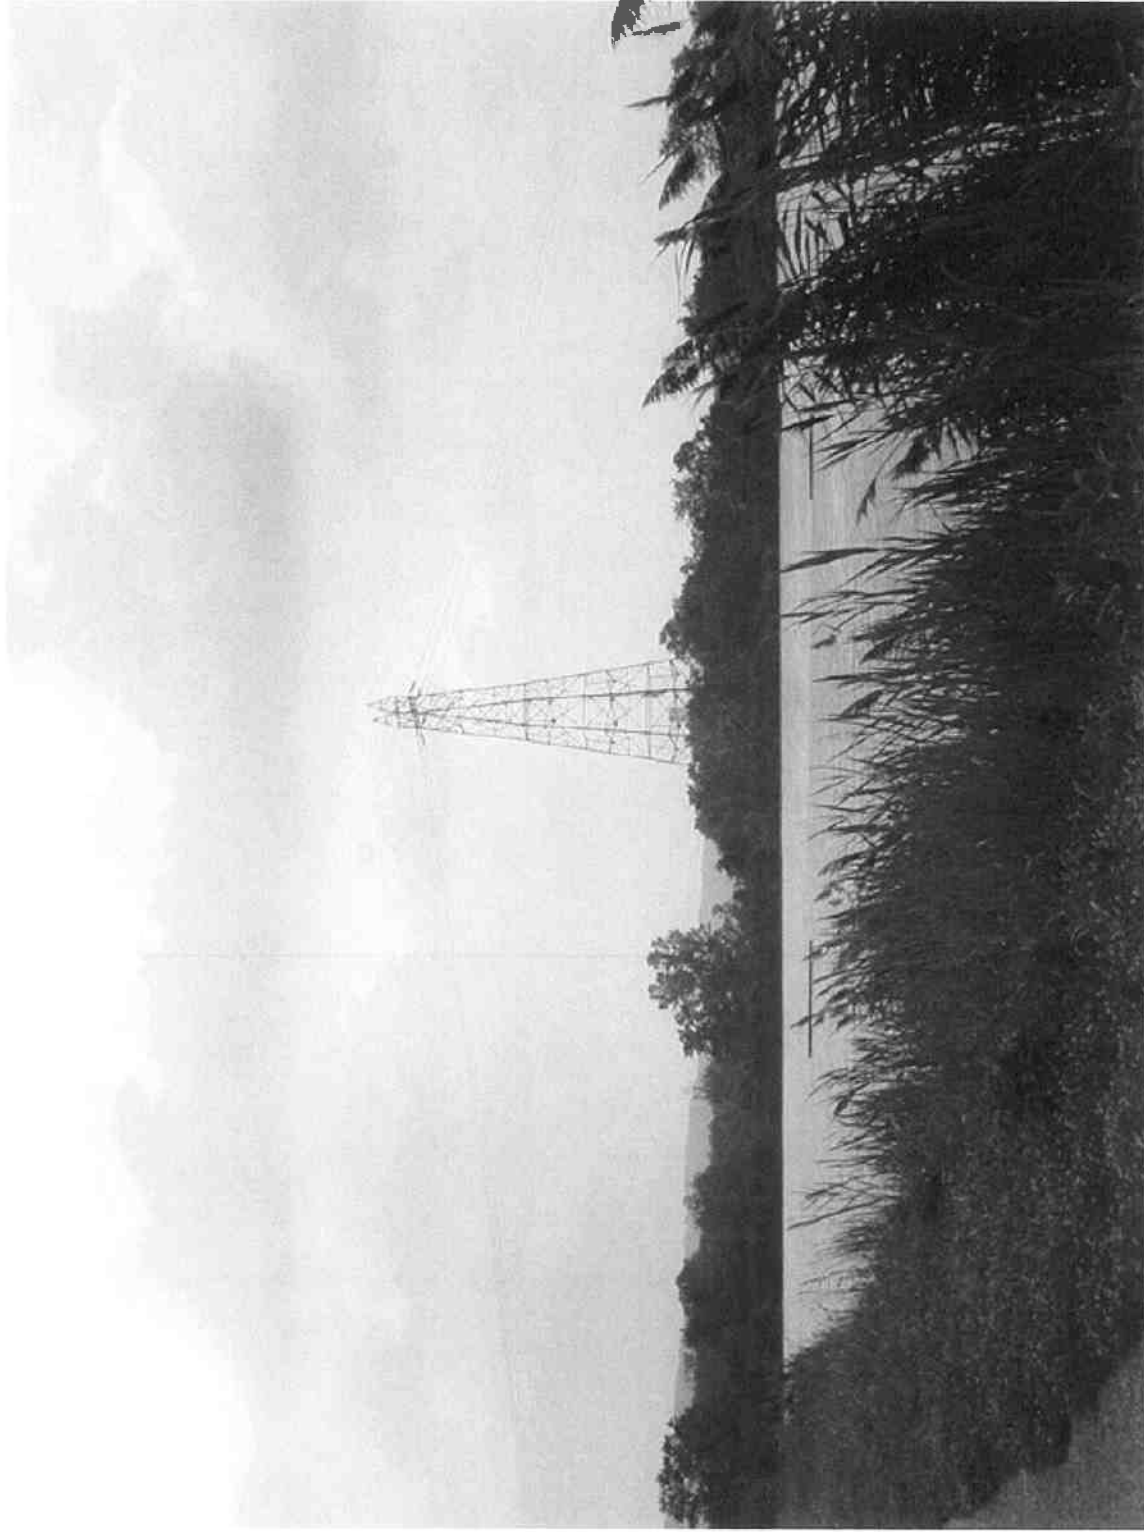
Facing East. Existing Kentucky Utilities 138-kV Transmission Line Structure with Ash Pond in Foreground.
